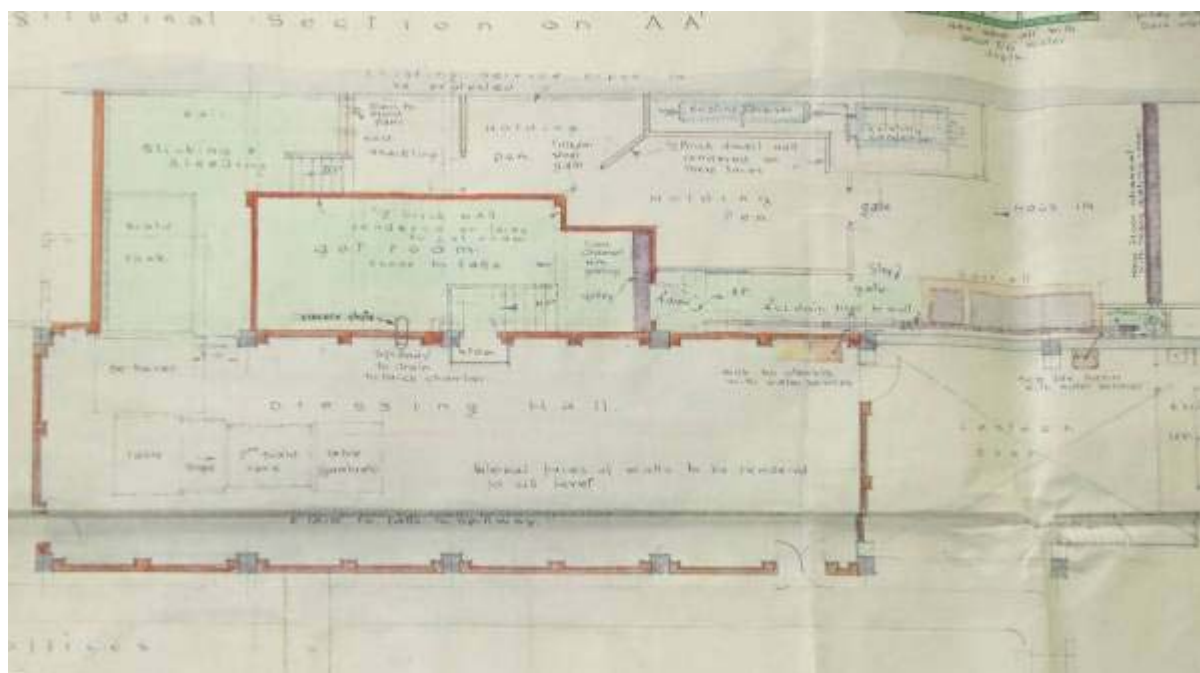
1954-5 building control plan of proposed alterations to the ground floor of the warehouse, N section E end of the building
